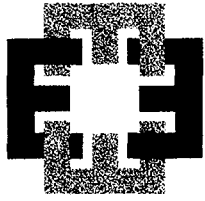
East-West (Z strip) Section – Net Axial Tension
